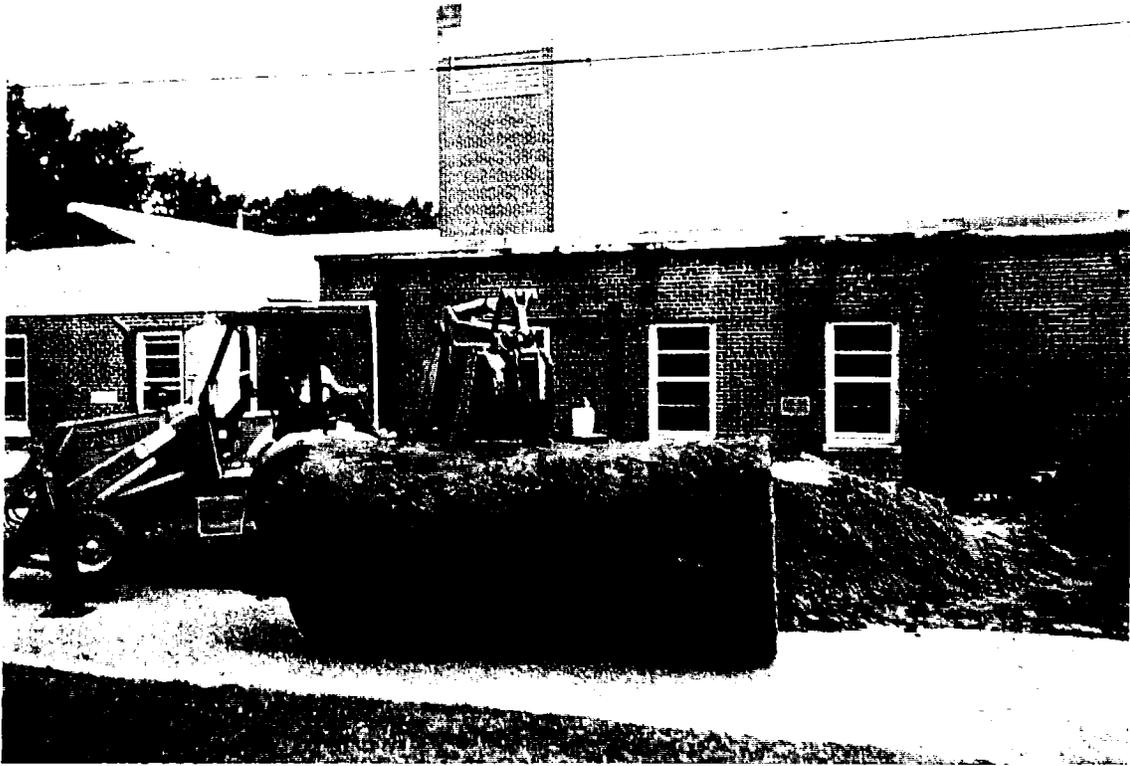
Tank C-11 after excavation. Note groundwater in the excavation.
